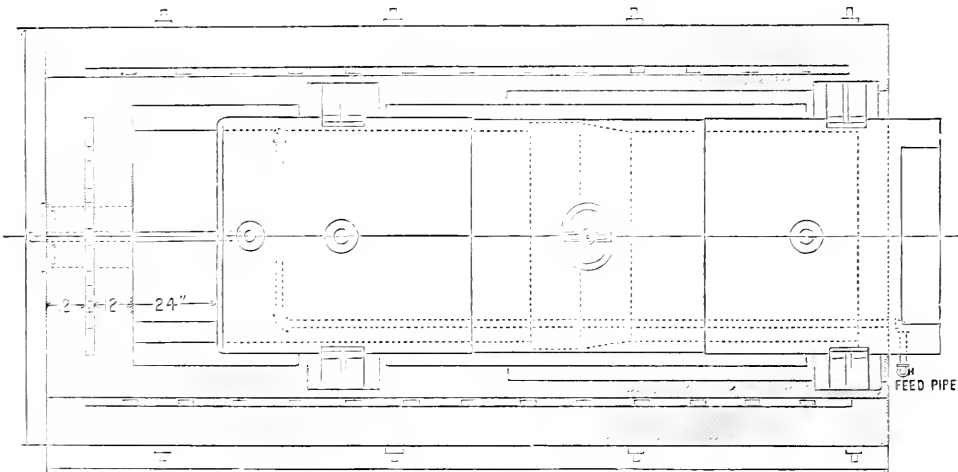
PLAN VIEW: SECTION THROUGH CENTER OF BOILER.
